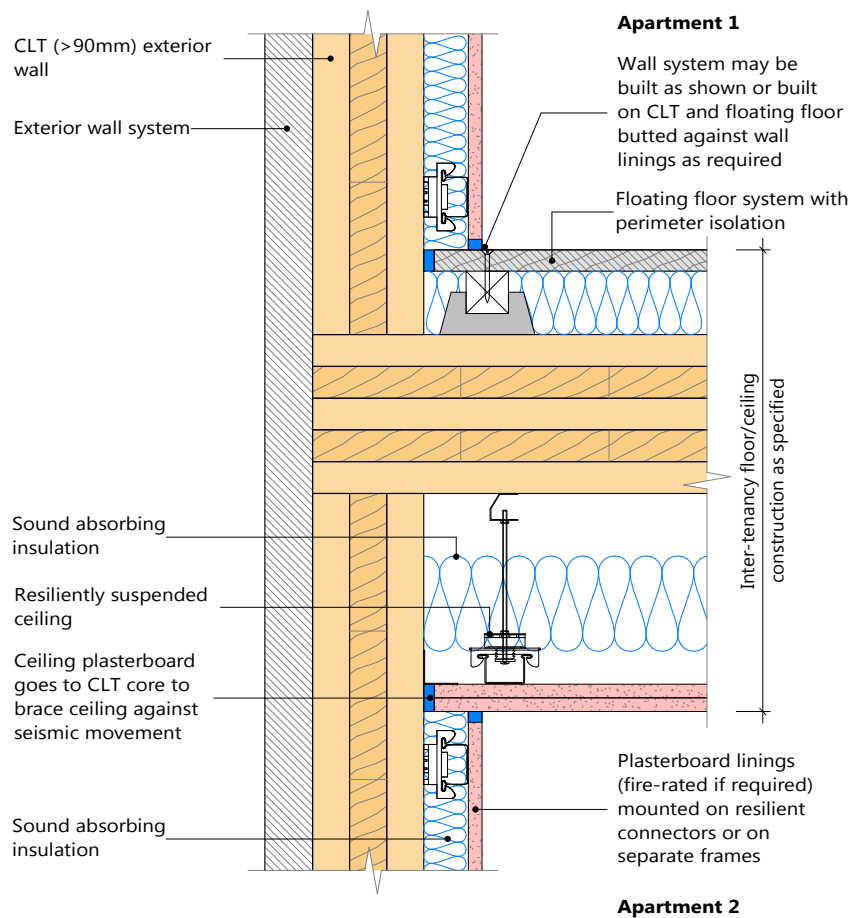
Conceptual details for intertenancy floor / exterior wall junction.
